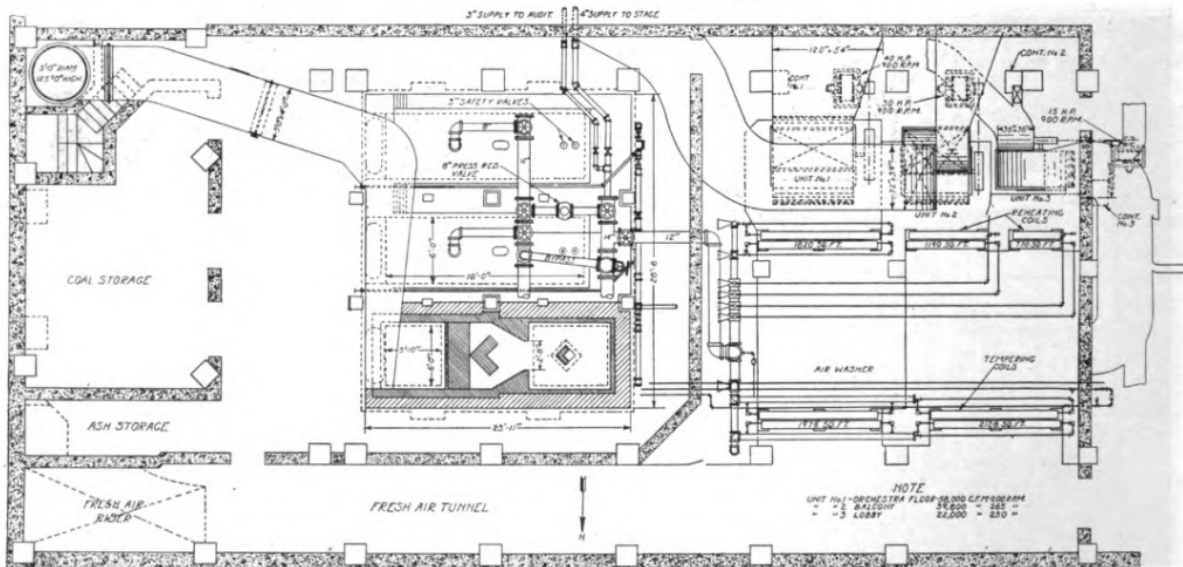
PLAN OF BOILER AND FAN ROOMS
